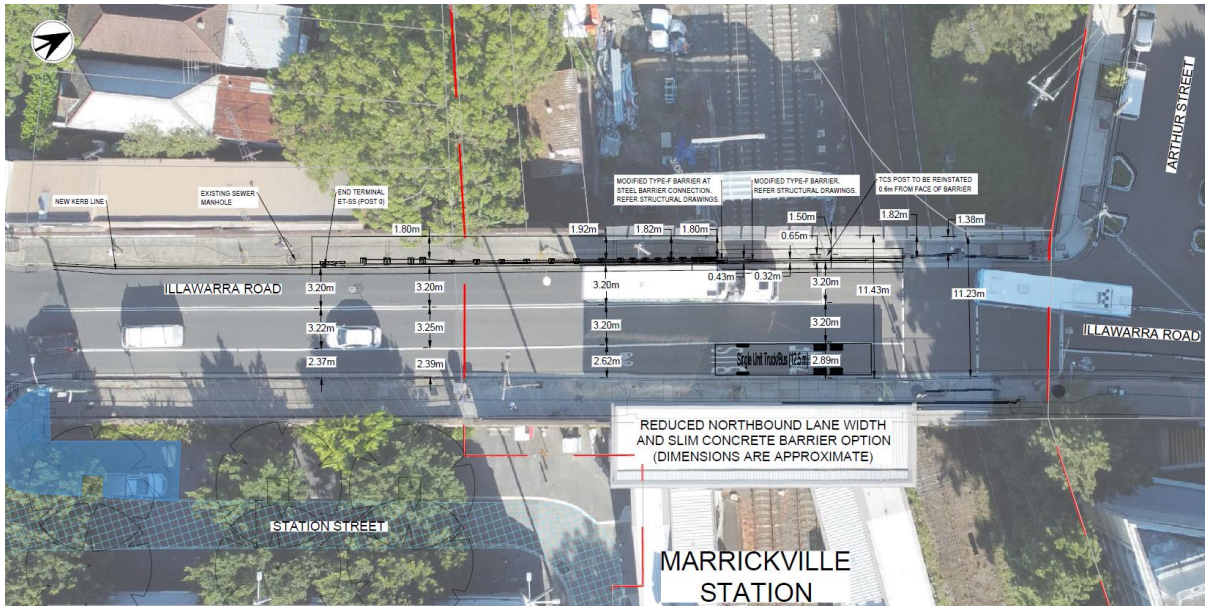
Plan of the proposed lane configuration of Illawarra Road at Marrickville Station
